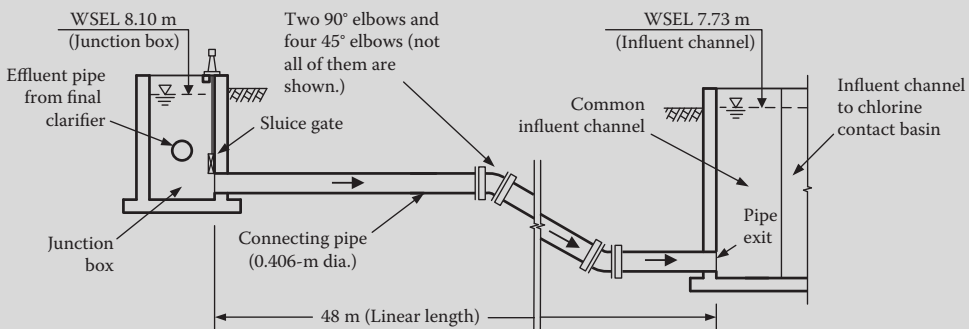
Longitudinal section of the connecting pipe (Example 14.4).
